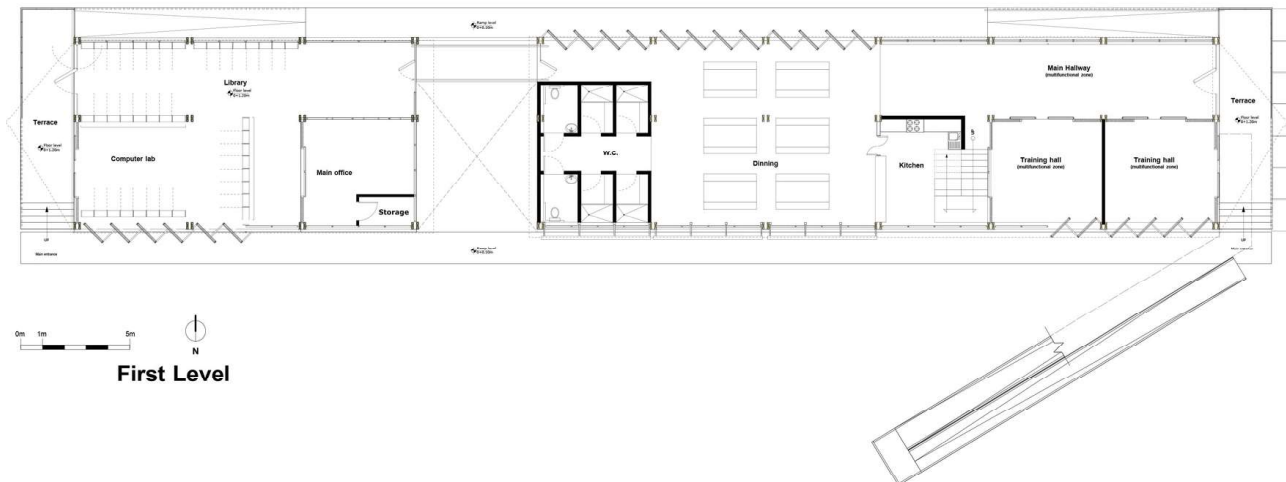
Second floor plan, (Source: Archdaily, 2014)
